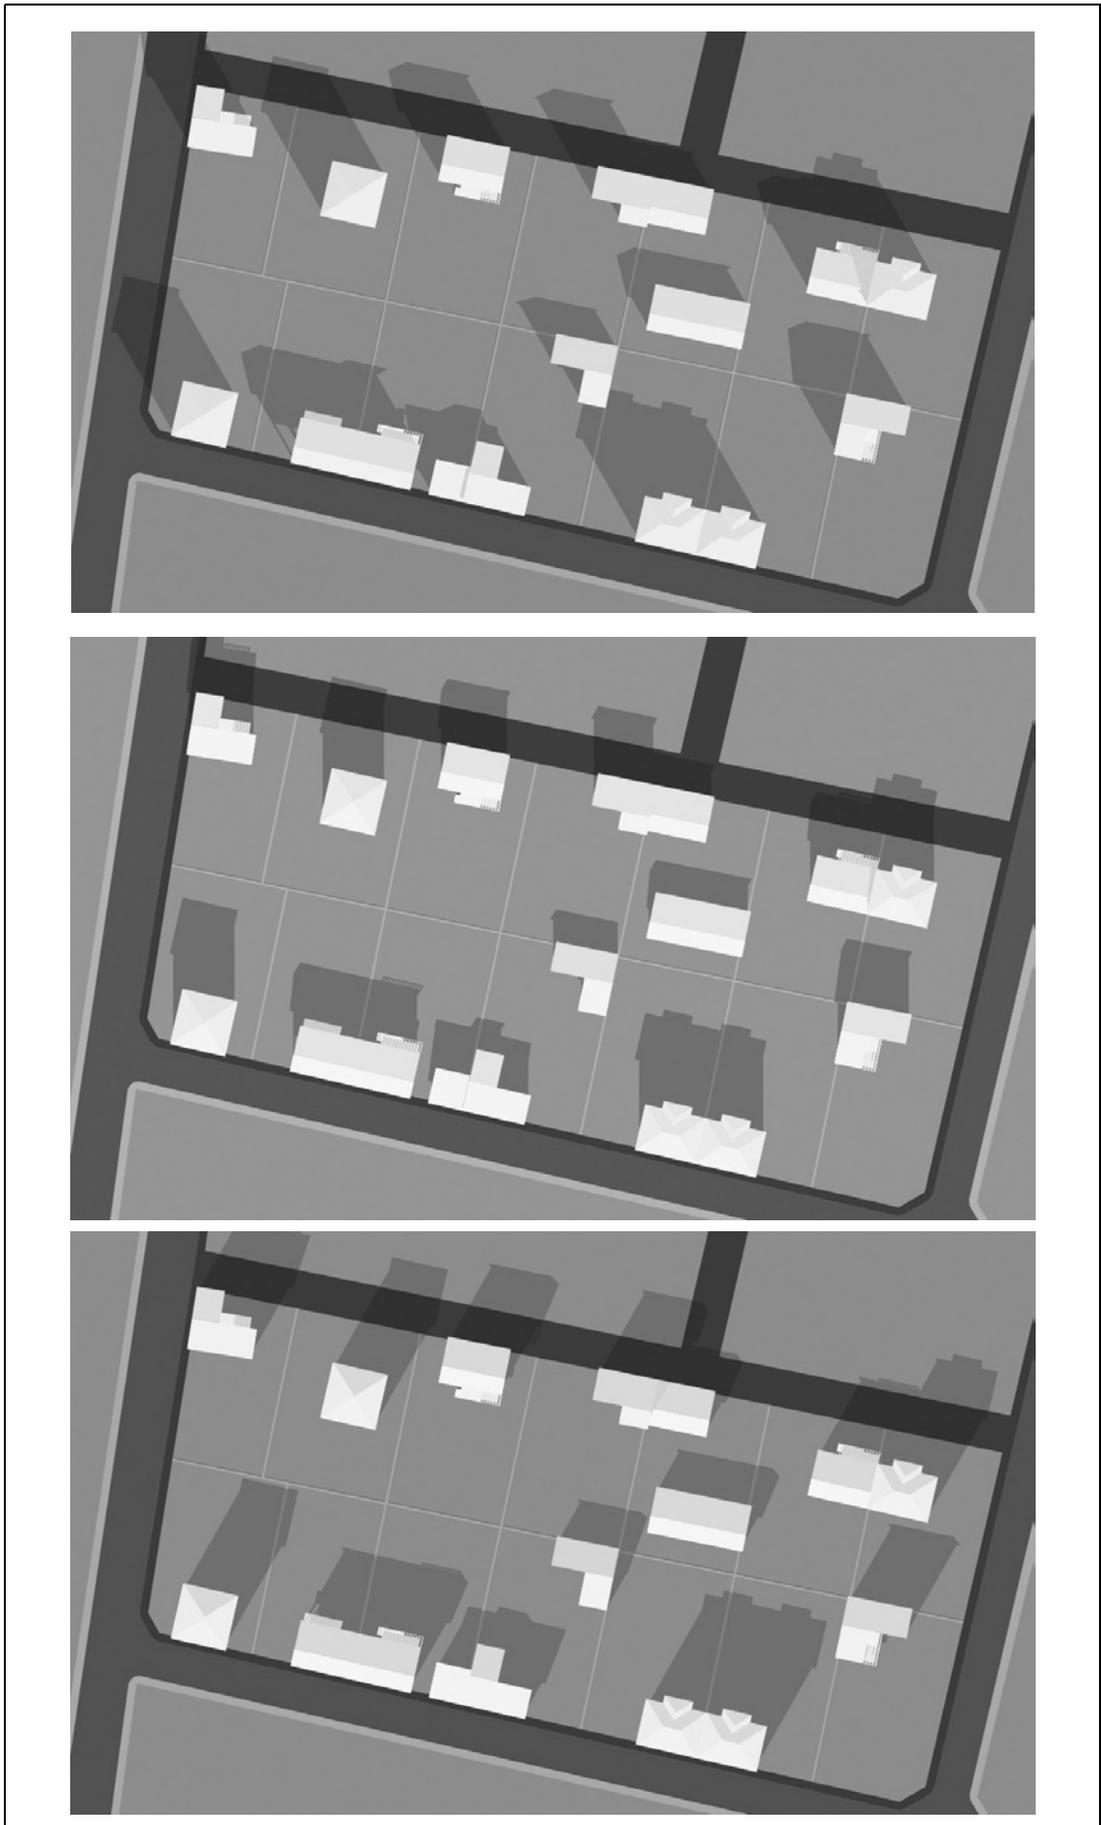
Top view of proposed site plan indicating the shading of each dwelling on 21st of December, at 10.00 am, 12.00 and 02.00 pm; Scale 1/1000
